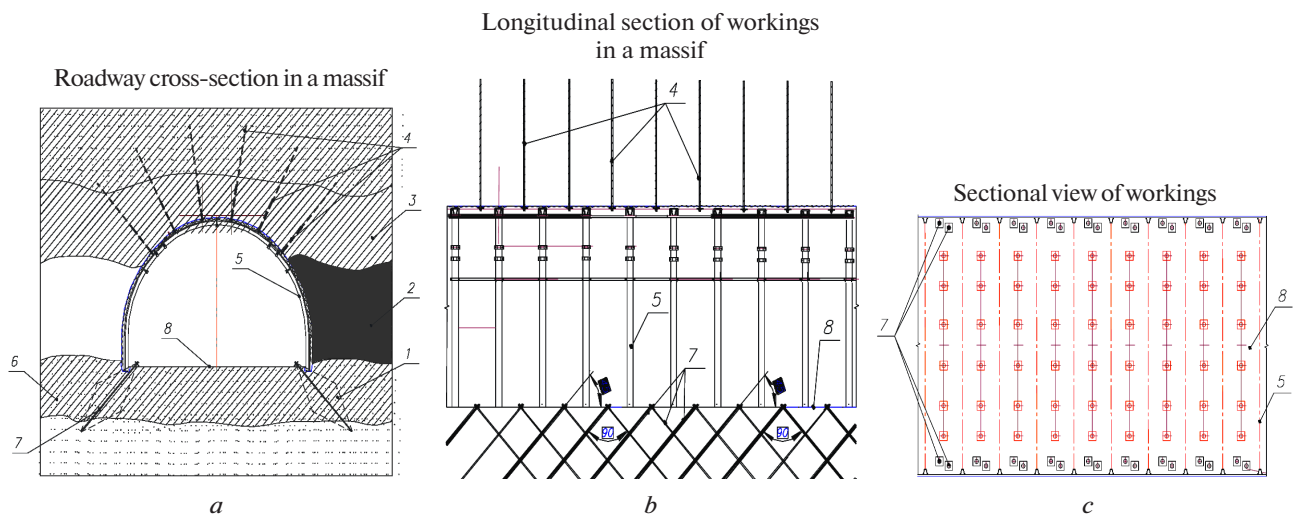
Cross-section (a), longitudinal (b) section of workings with ground anchors and a sectional view – installation setup of the ground anchors relative to the arches of the roof bolting (c):
